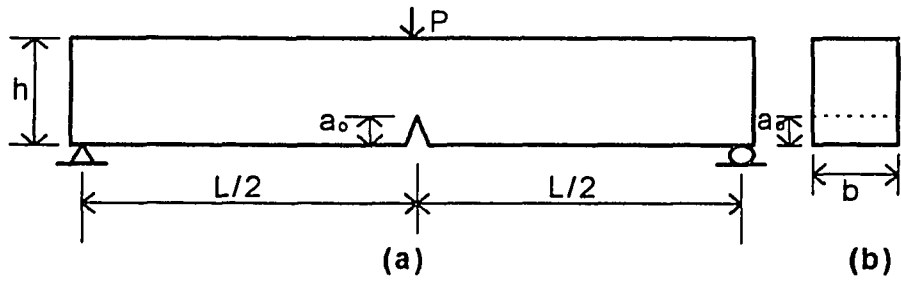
(a) Three Point Load Beam Geometry; (b) Section
